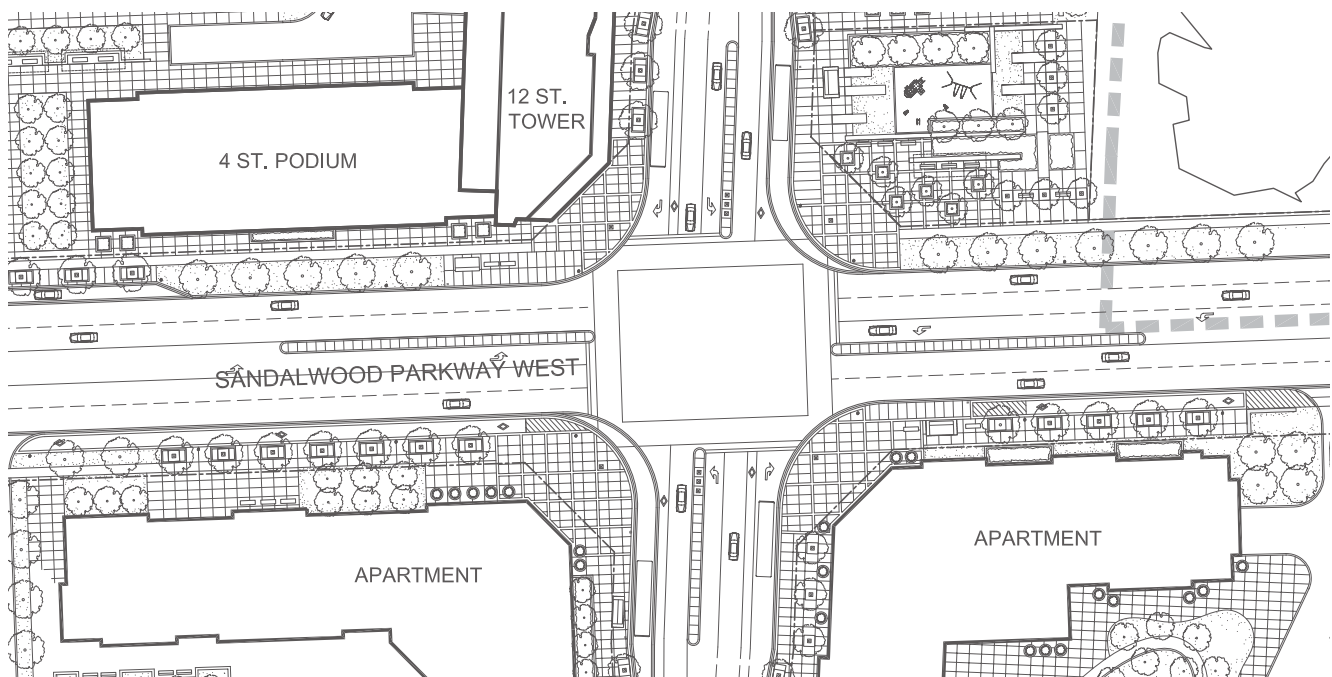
Mixed-Use Nodes will be characterized by an urban streetscape treatment with built form oriented to the street.
